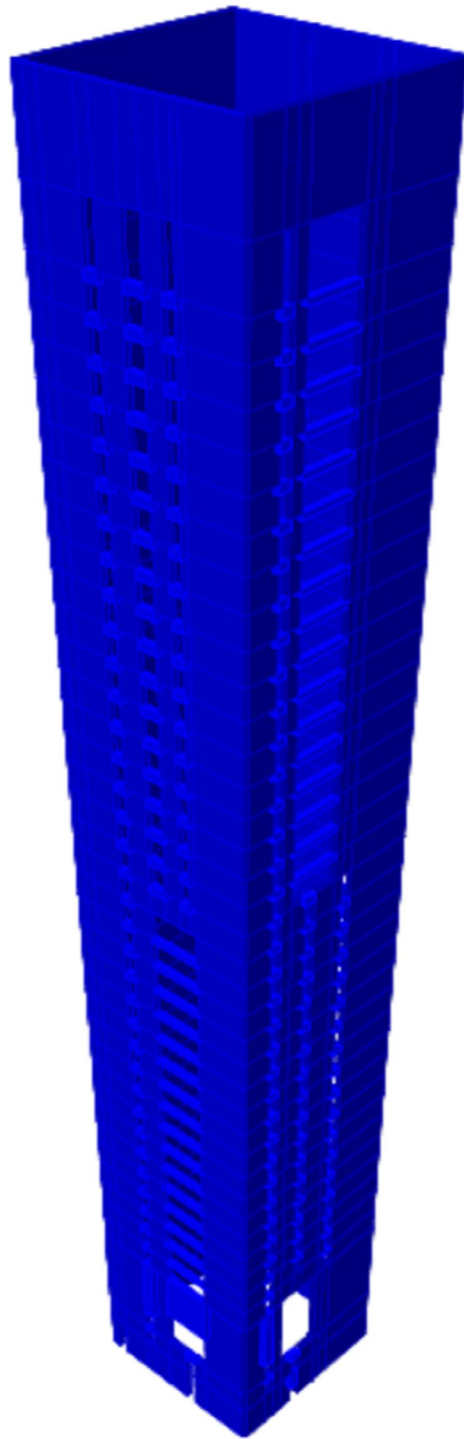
Ordinary Reinforced Concrete Shear Wall Core
